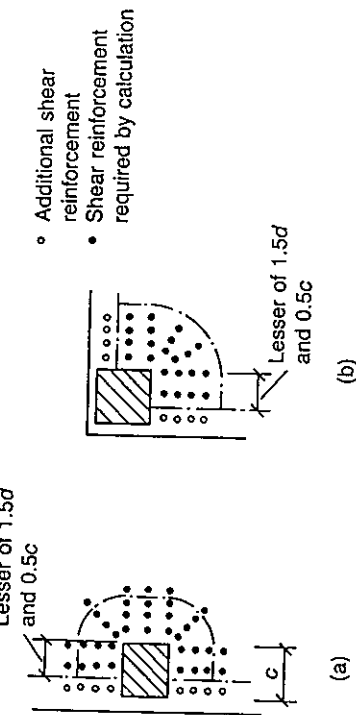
Shear reinforcement at edge and corner columns
